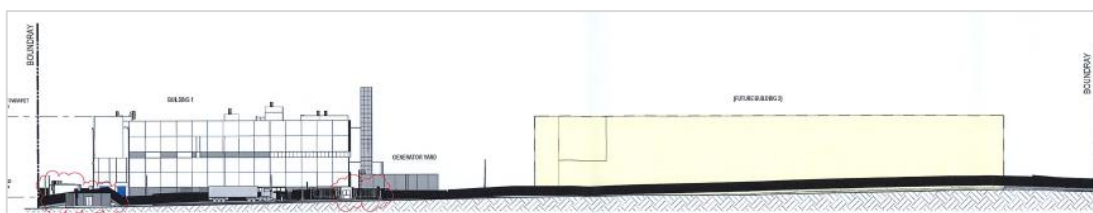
Elevation as approved from Eastern Creek Drive under SP-19-00013
